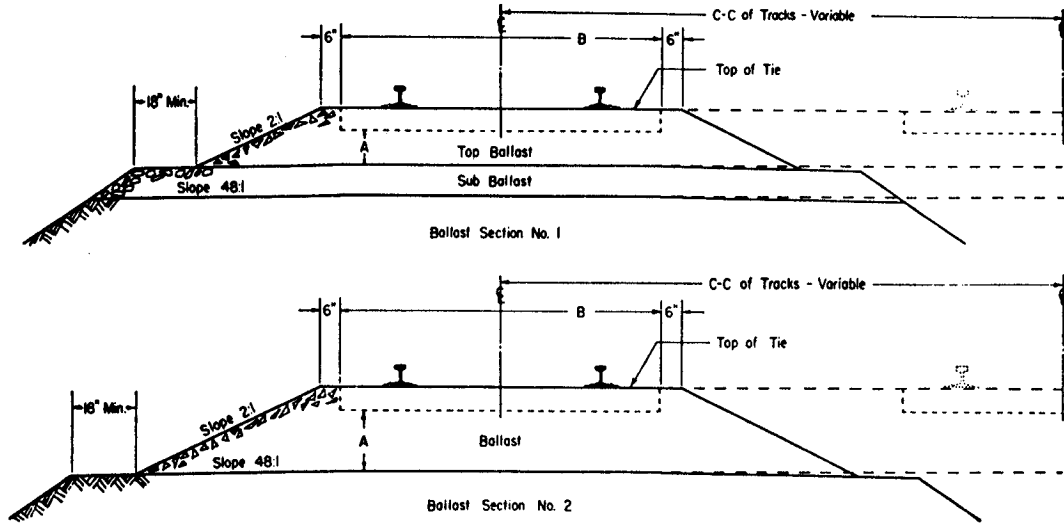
AREA ballast sections, single and multiple track, tangent.
